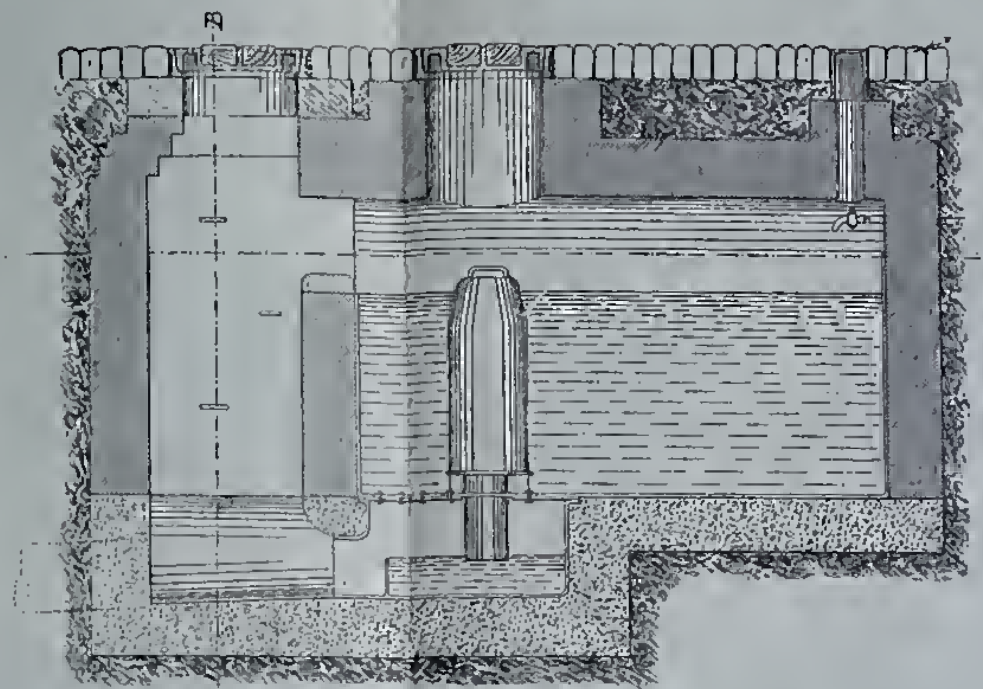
Longitudinal Section, showing Chamber with Iron Trapping Box.
